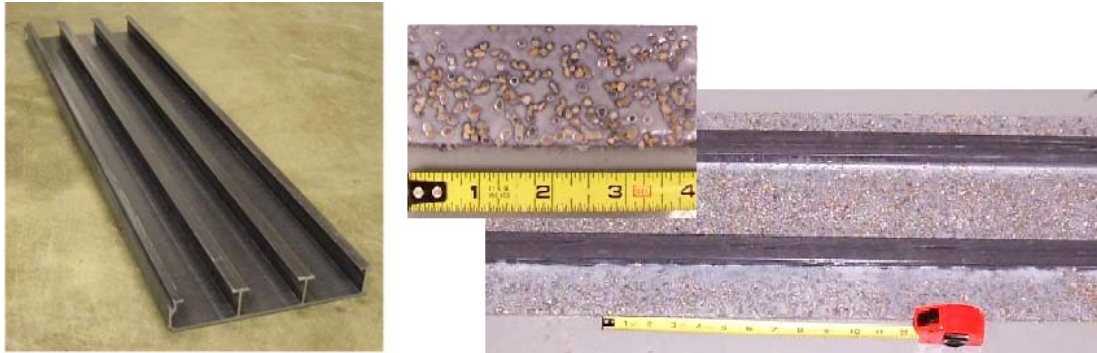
FRP plank used as stay-in-place formwork with aggregate for bonding.
